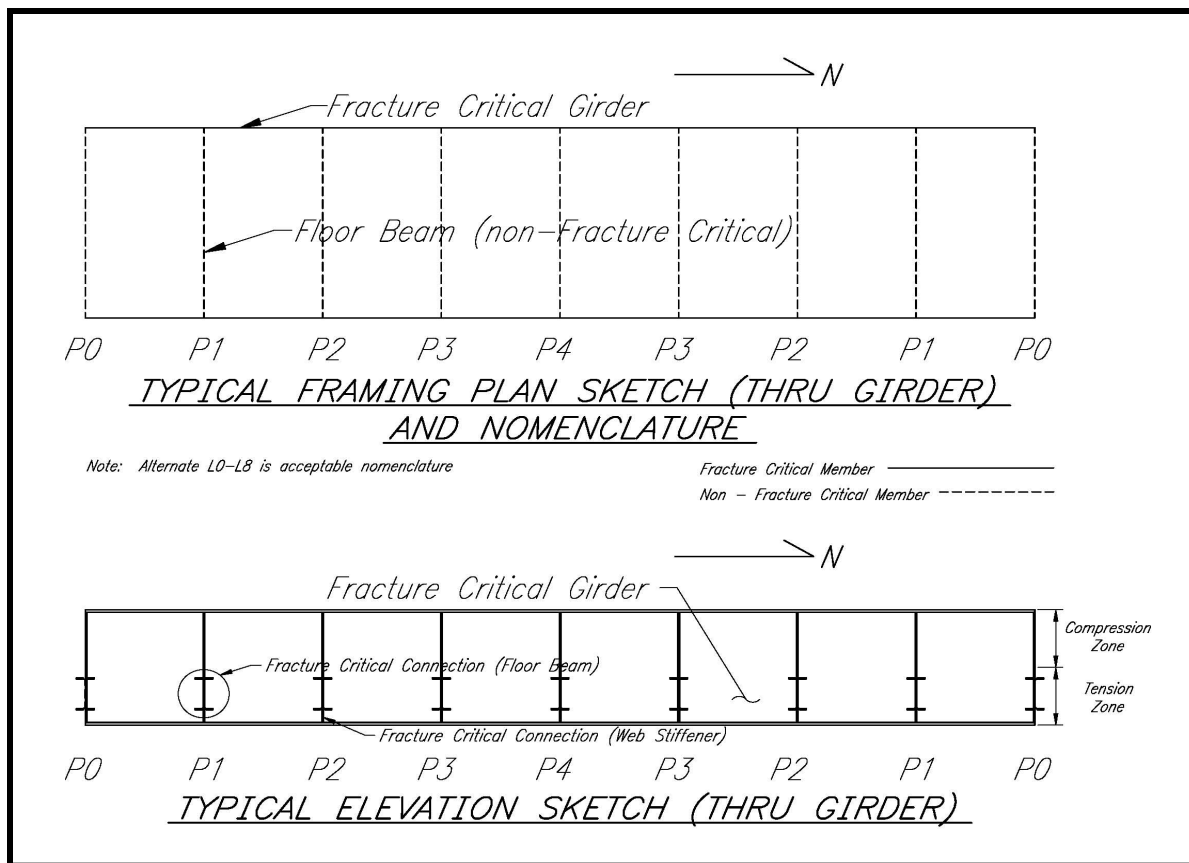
4-5: Example Inspection Plan Sketches (Through Girder)
